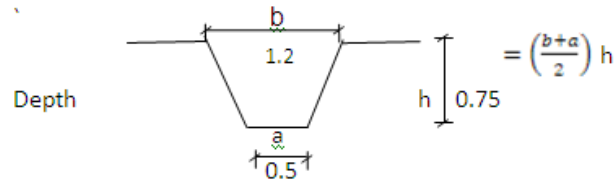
DETAILED ESTIMATE OF A CEMENT CONCRETE ROAD WITH SIDE DRAINS
